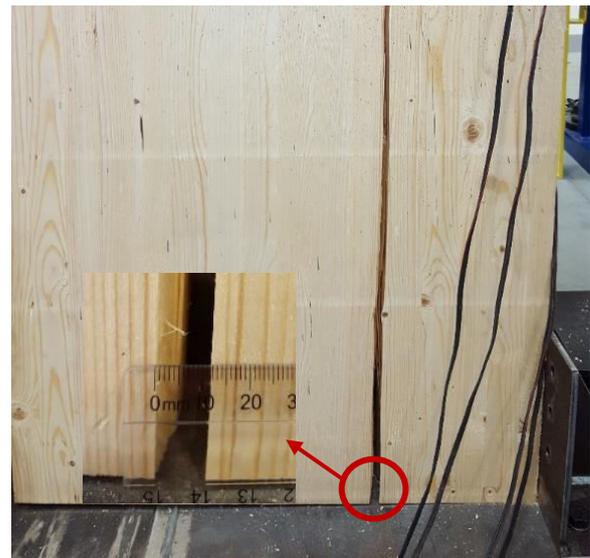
Crack in the frame column caused by tension perpendicular to the grain.
